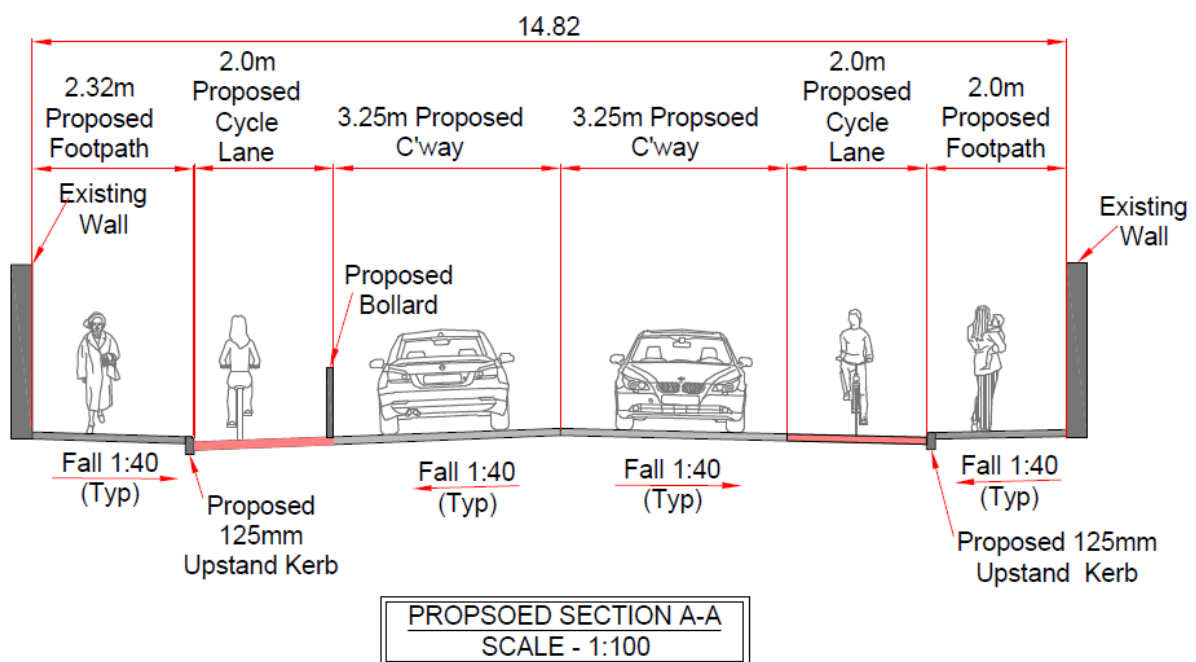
Cross section of the Recommended Scheme with removal of right turn lane onto Beech Hill Road, which allows provision of 2.0m wide cycle lane and footpath on both sides of the road at the existing 'pinch-point'
